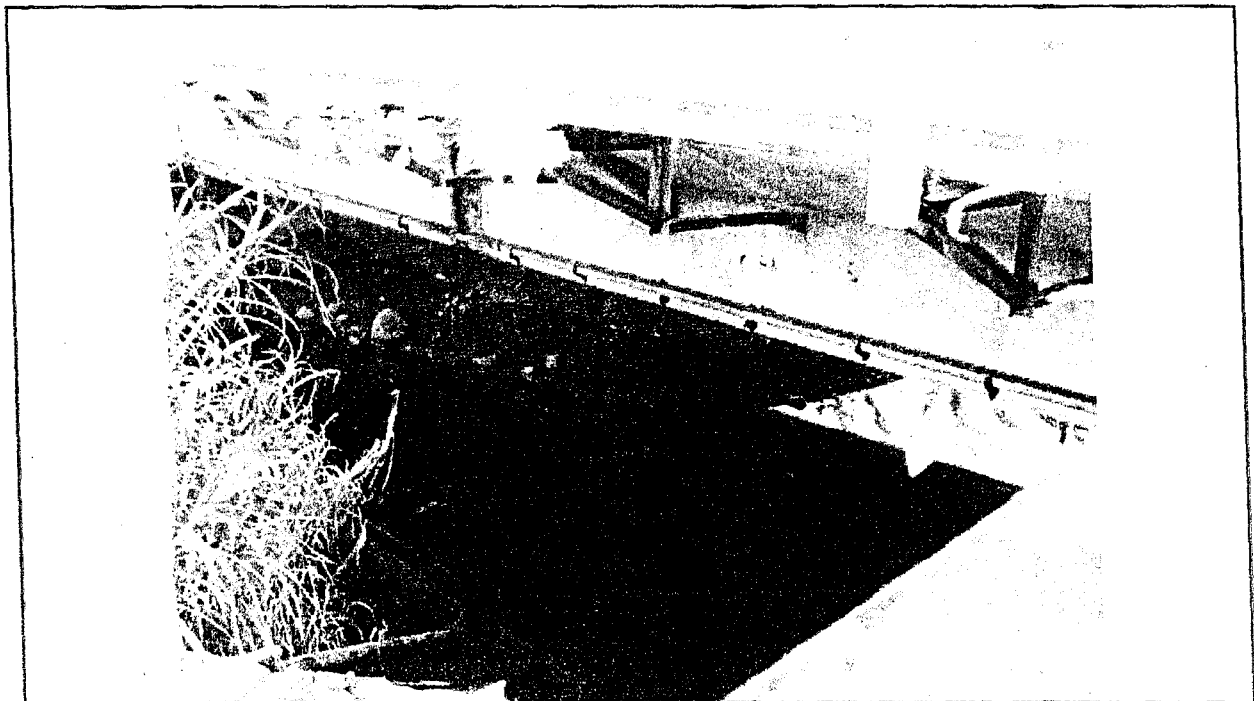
Photo of Kaipapa`u Bridge, Mauka Side, Showing Kaipapa`u Stream and Underneath the Pedestrian Walkway.
